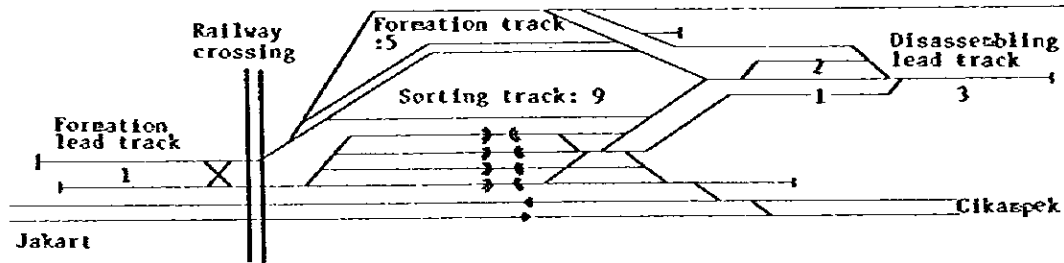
Track Layout Sketch (Cipinang)
